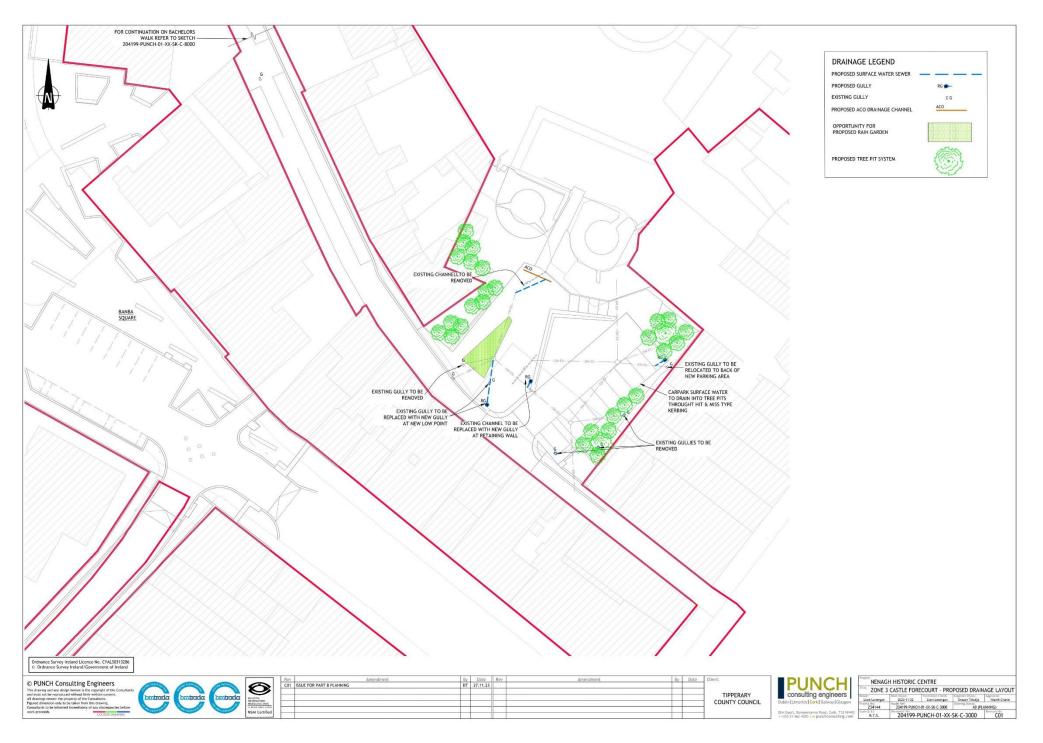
Proposed Stormwater Drainage Nenagh Castle Forecourt (NHCQ Zone 3)
